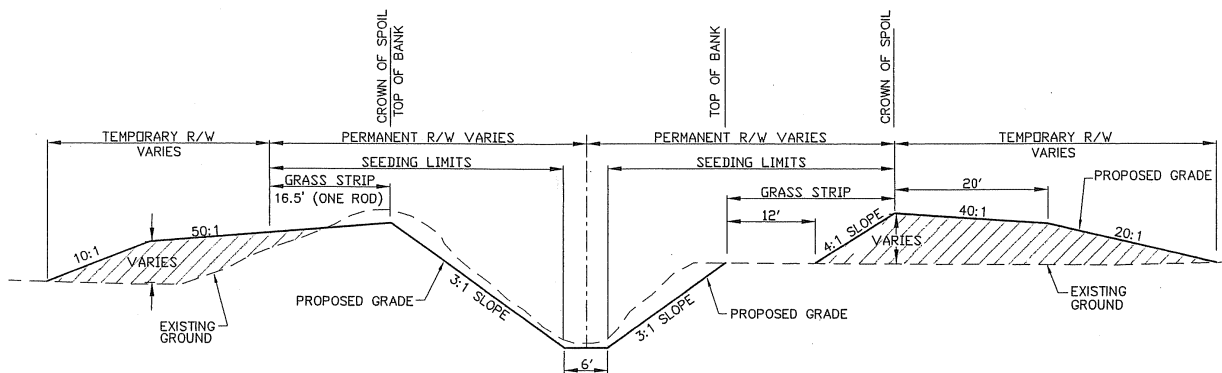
Typical Current Drainage Ditch Designs with Adjacent and Set-Back Spoil Banks (not to scale)
